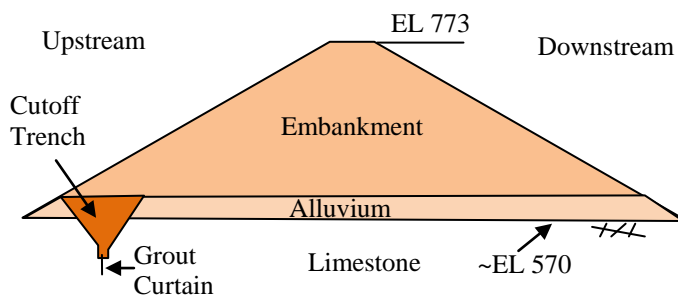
Schematic of typical Wolf Creek Dam Original Construction Cross-Section
